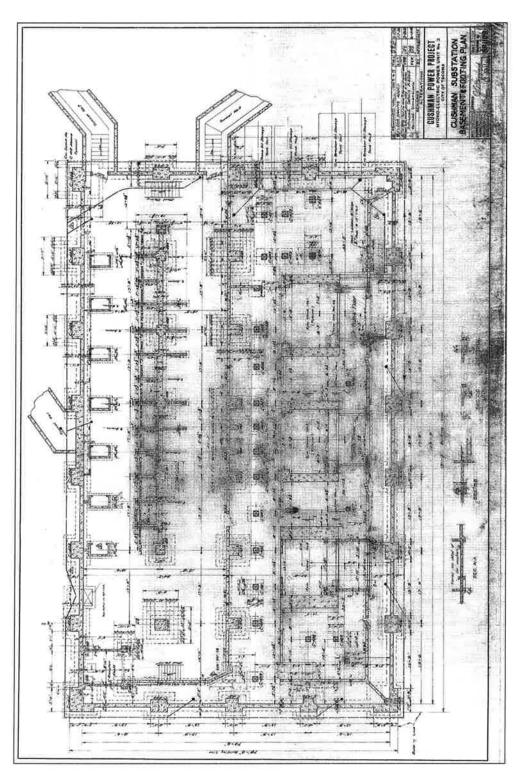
Design drawings of Cushman Substation, Basement and Footing Plan, December 1924. Image courtesy of Tacoma Power.
